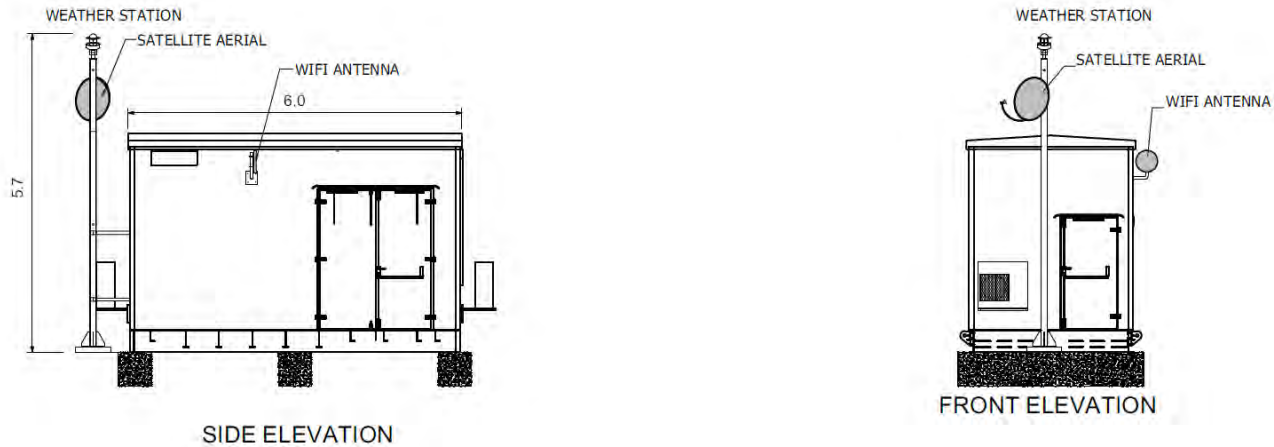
BESS Control Room Front and Side Elevation (Extracted from BESS Control Room Elevations [EN010140/APP/6.2.3.8])
